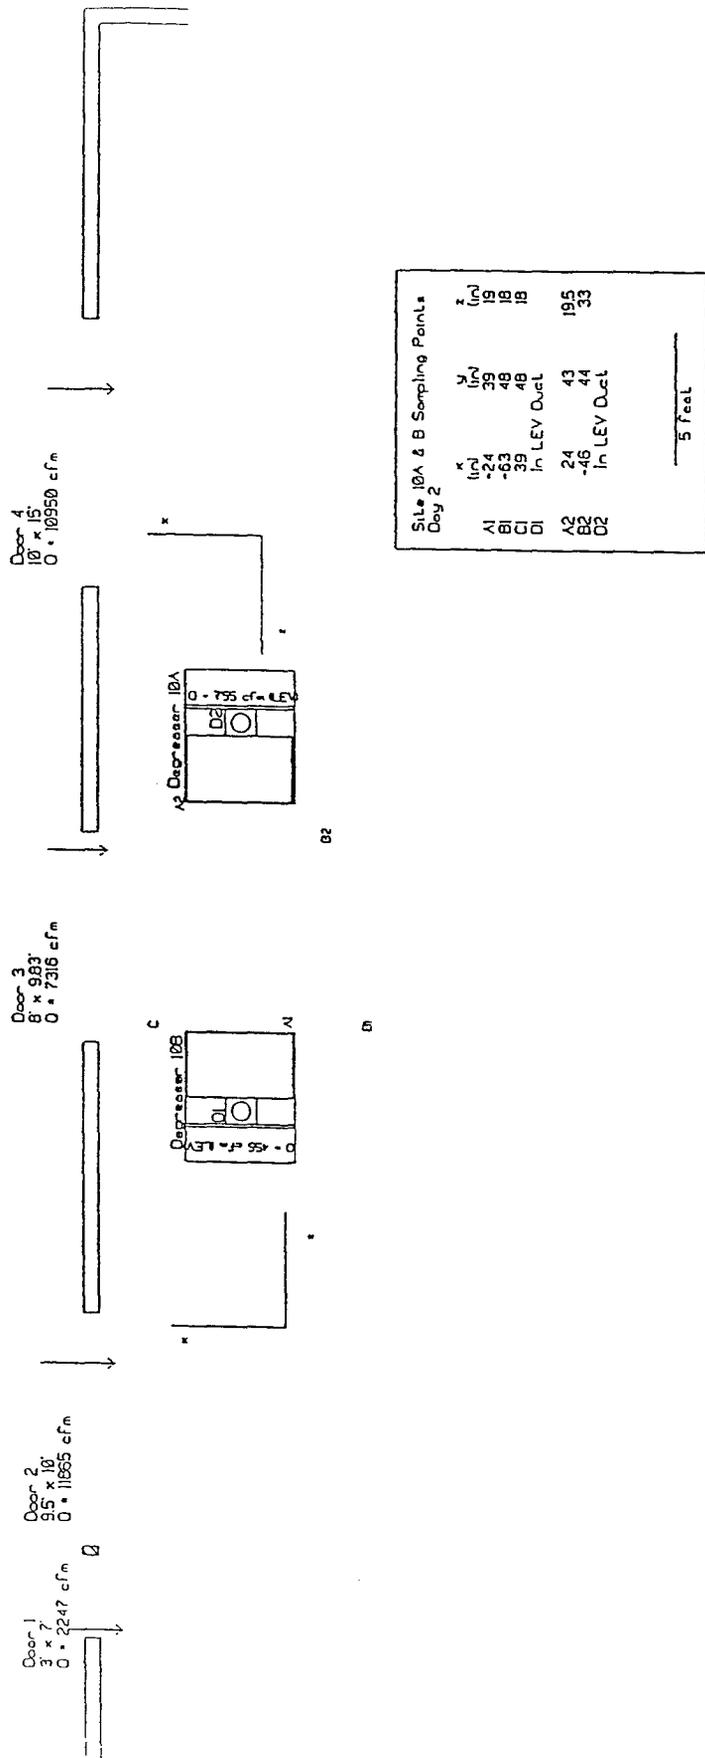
Plan view of site 10a and 10b degreasers, day 2.
